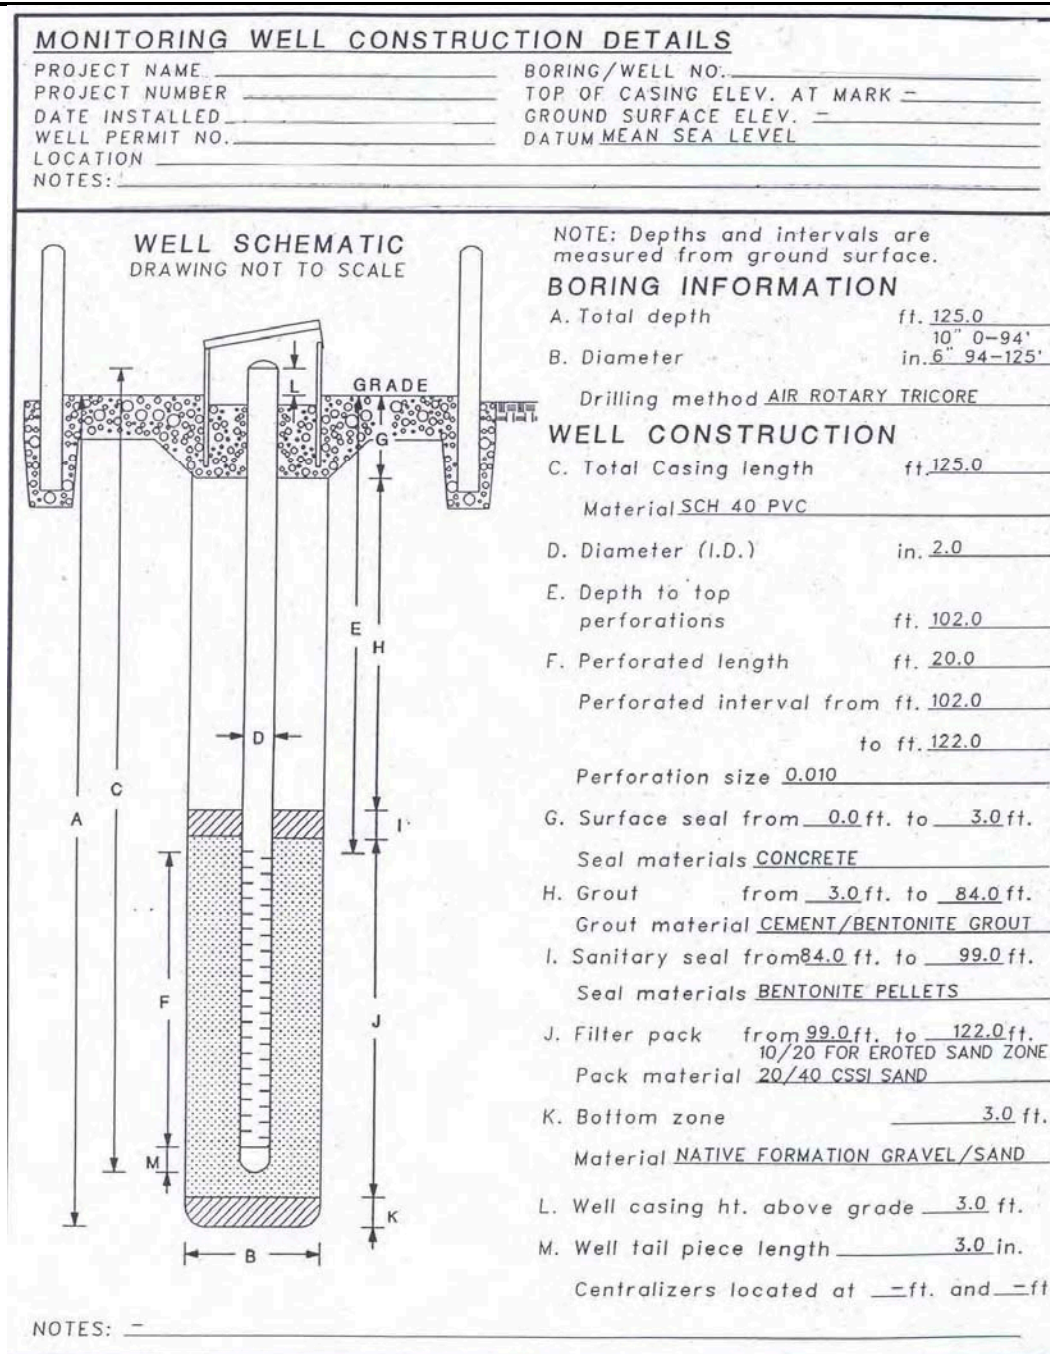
As-built construction details for monitoring well at wastewater land application sites.⁶
